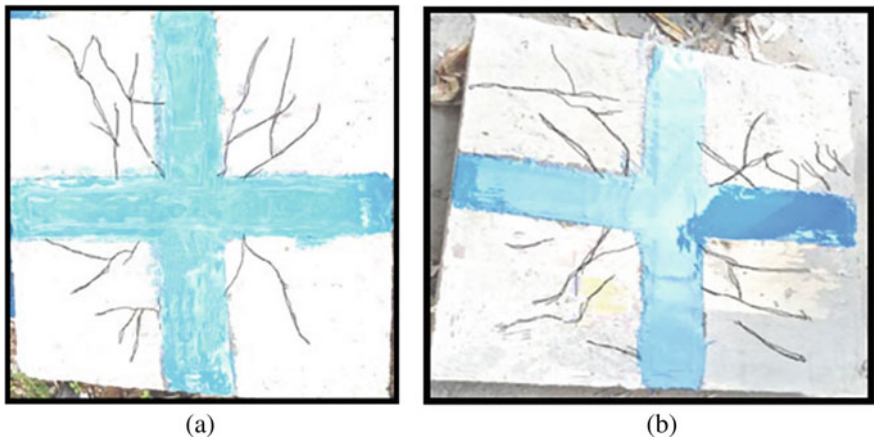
a Crack patterns for plus wrapped slab specimen 1 and b crack patterns for plus wrapped slab specimen 2
